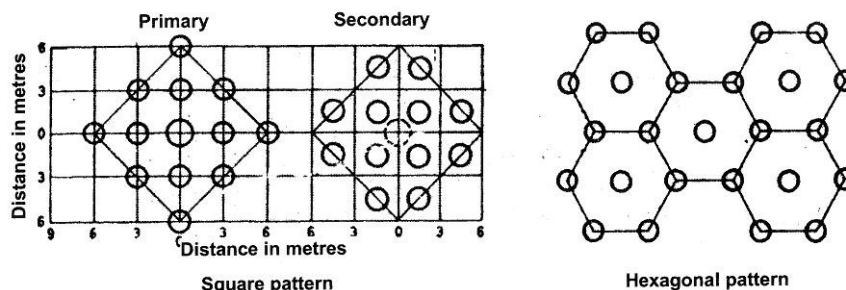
Typical Pattern of Grout Holes for Consolidation
